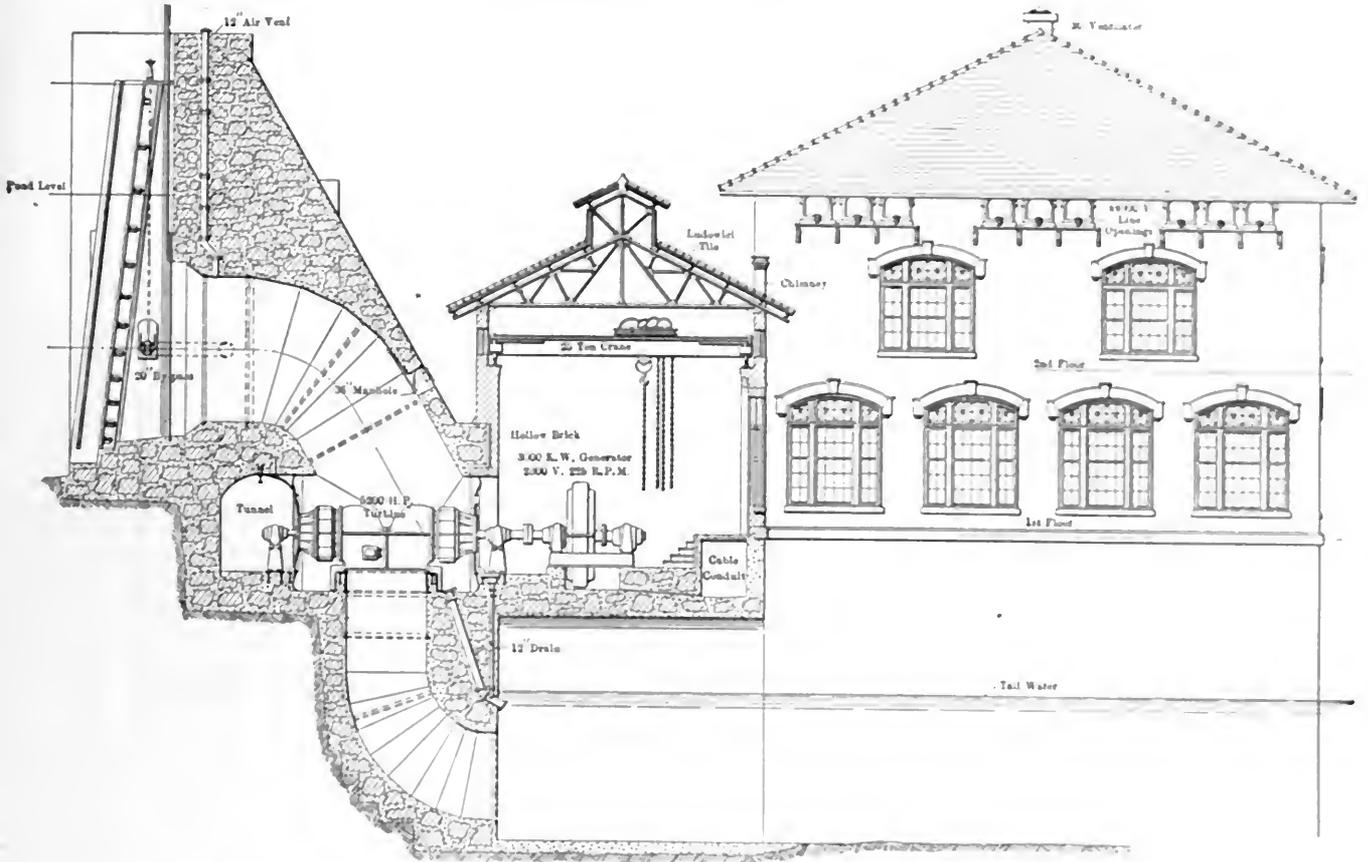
SECTIONAL ELEVATION OF ROCKY CREEK GENERATING HOUSE, INTAKE AND HEAD GATES
